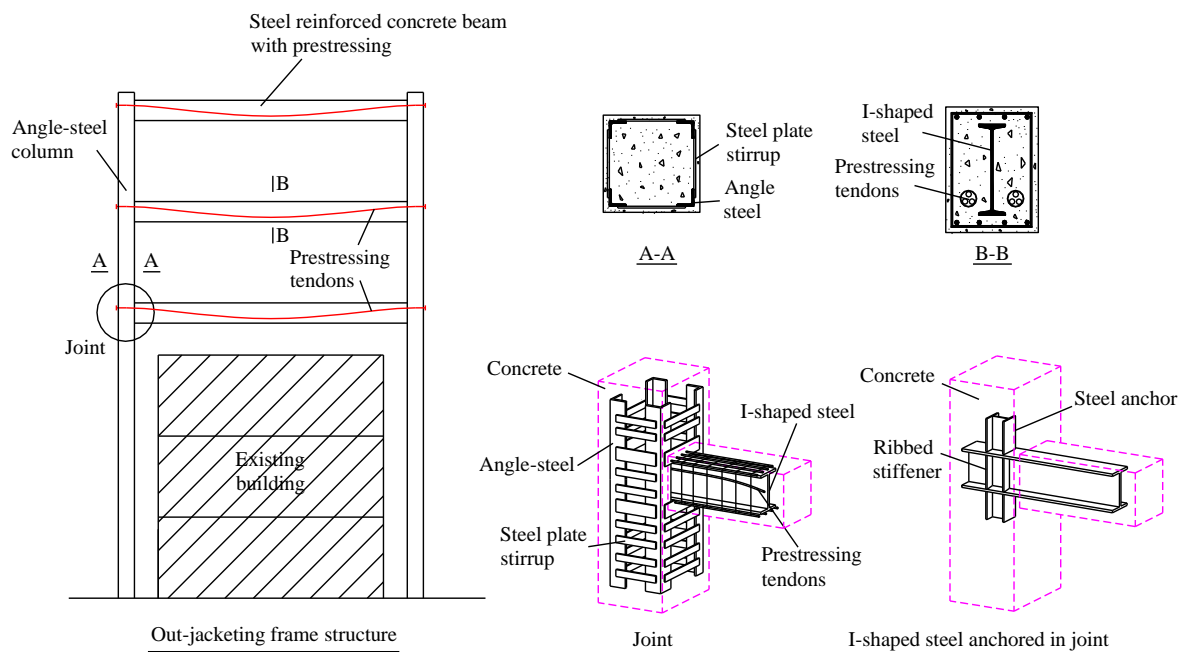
Schematic view of out-jacketing frame and beam-column connection
